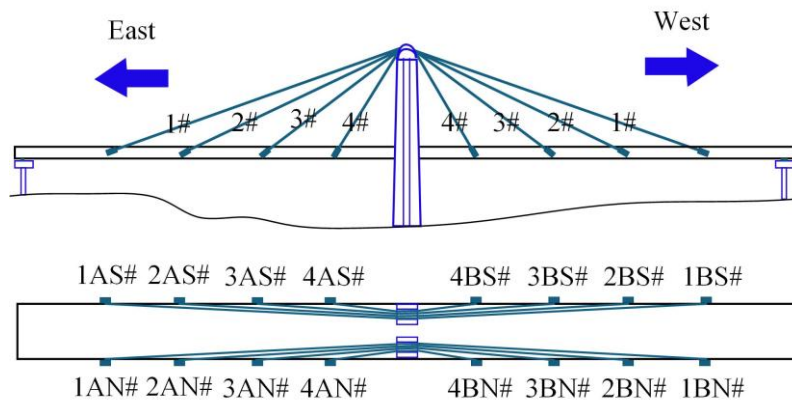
Bridge plane temporary cable number diagram (unit: cm)
